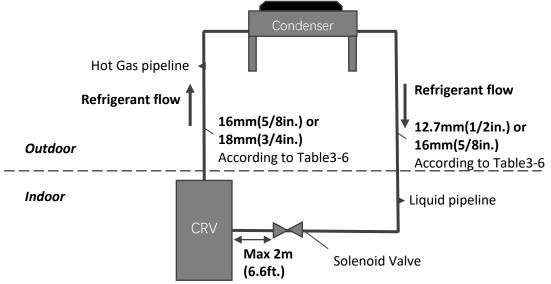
Installation position of Solenoid valve and pipe dimensions
